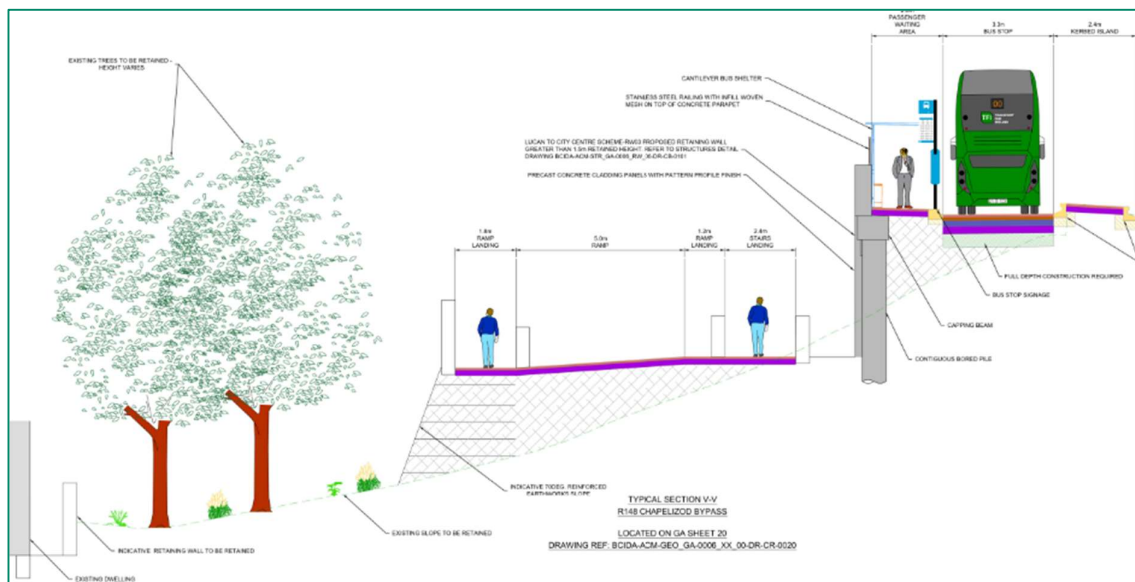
Typical Cross-section Adjacent to Knockmaree Apartments
